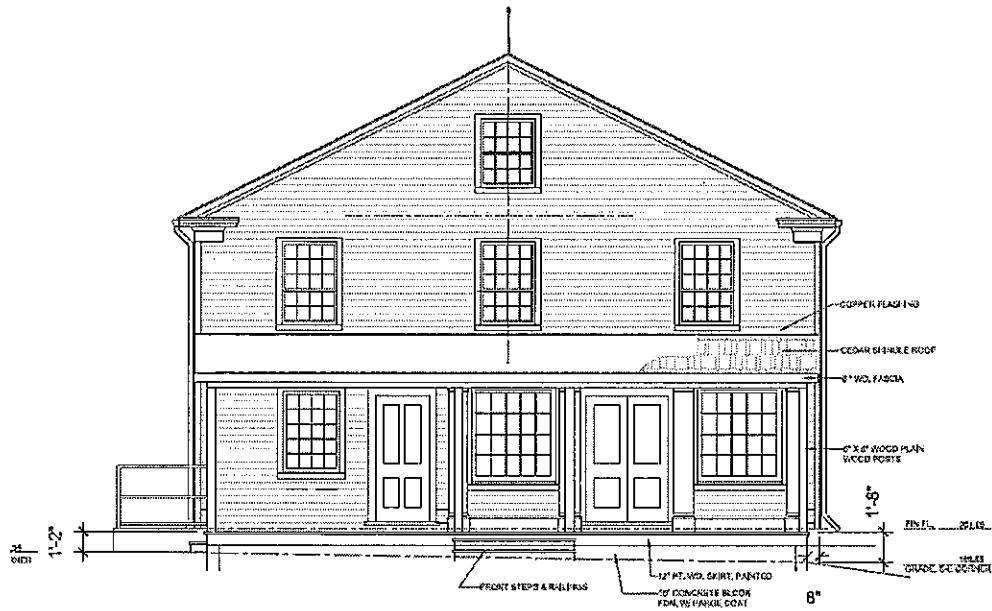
Front (South) Elevation, proposed alterations with verandah roof detail.
